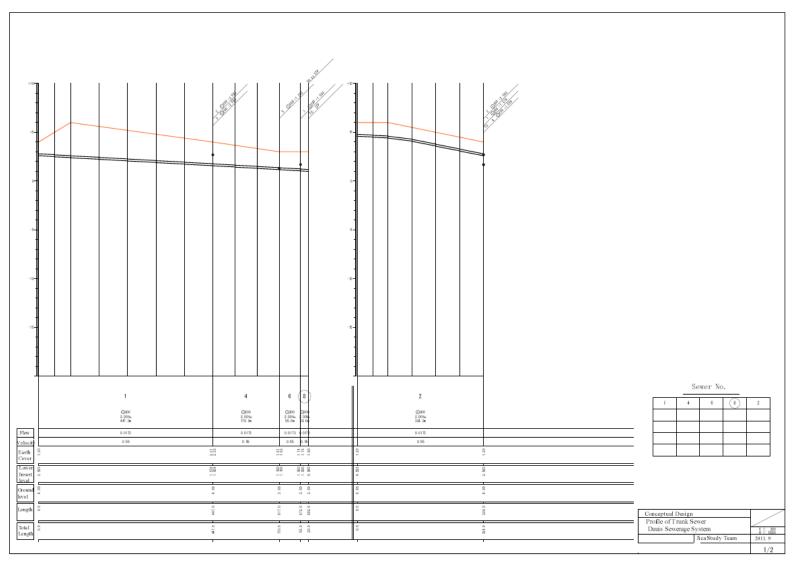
Profile of Trunk Sewer (Dauis Sewerage System)
